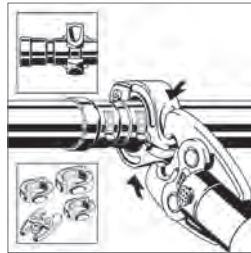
Place the Mega-press press ring around the press connector. Ensure that it is properly fitted. Carry out the pressing using the adapter jaw until the press ring is completely closed.
